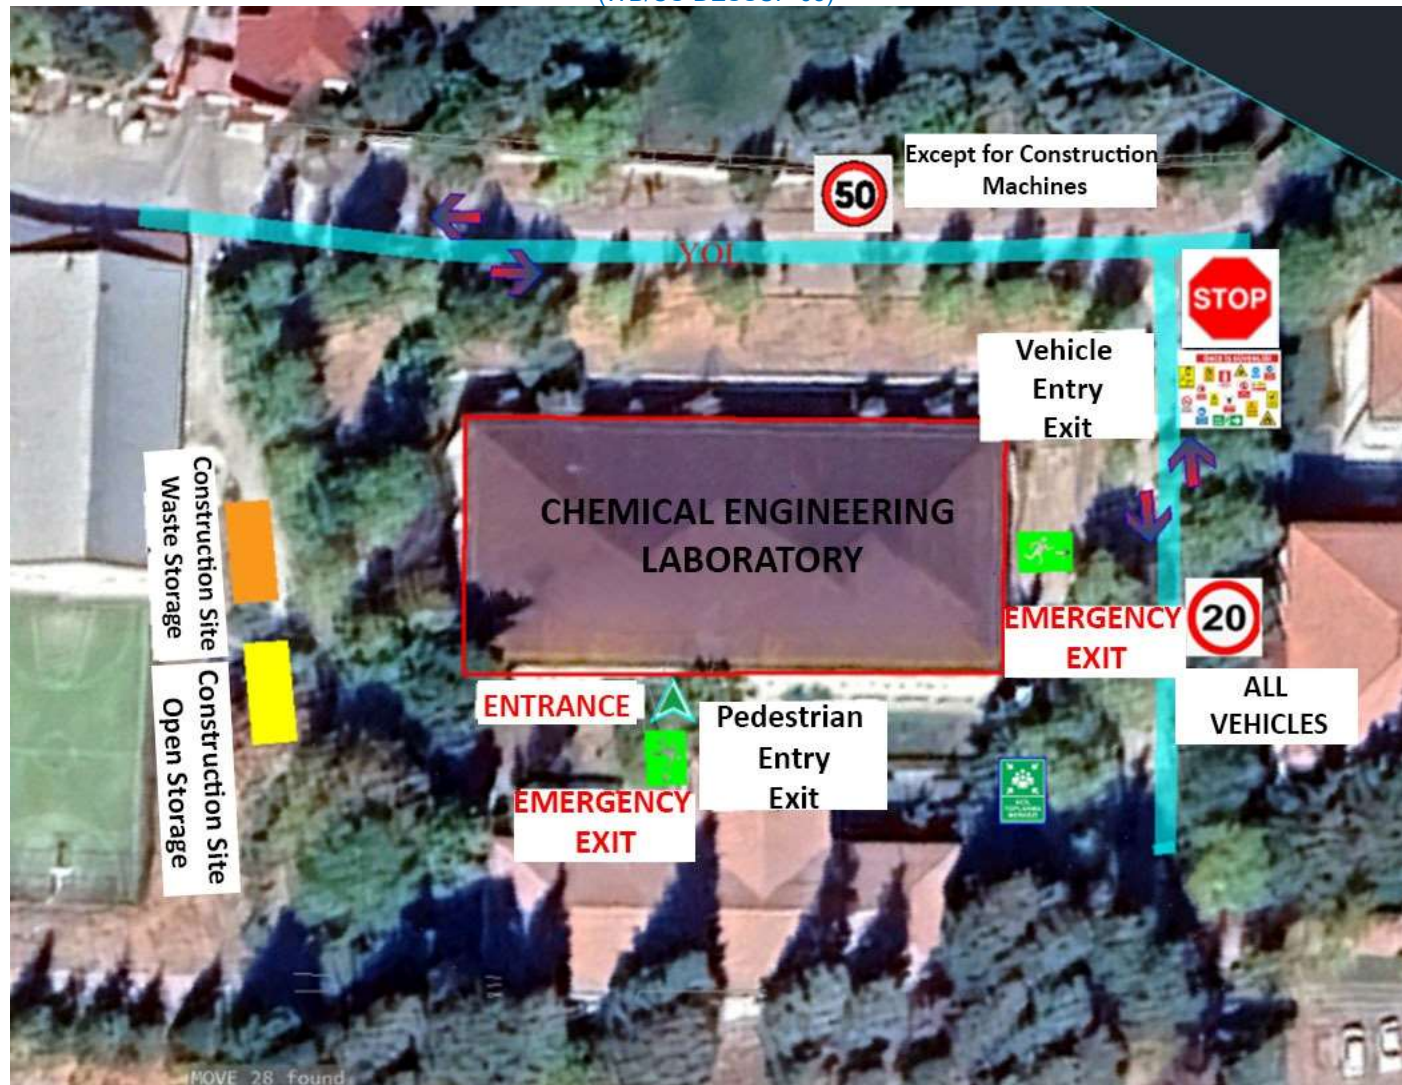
Site Traffic Plan for the Chemical Engineering Laboratory Building
